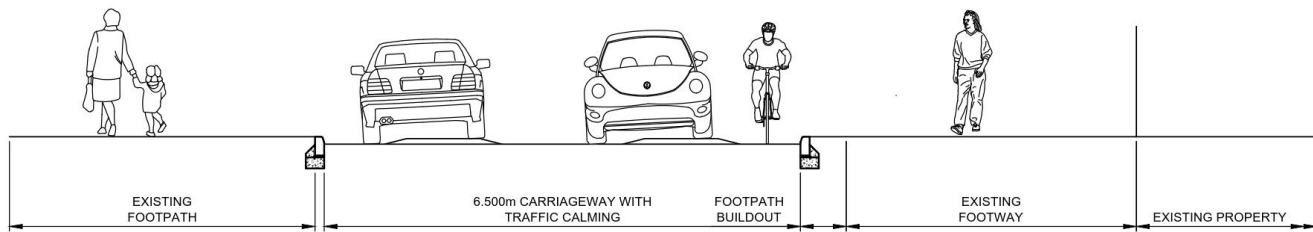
Cross Section Route 6 – Railway Bridge to Newcraighall Drive
